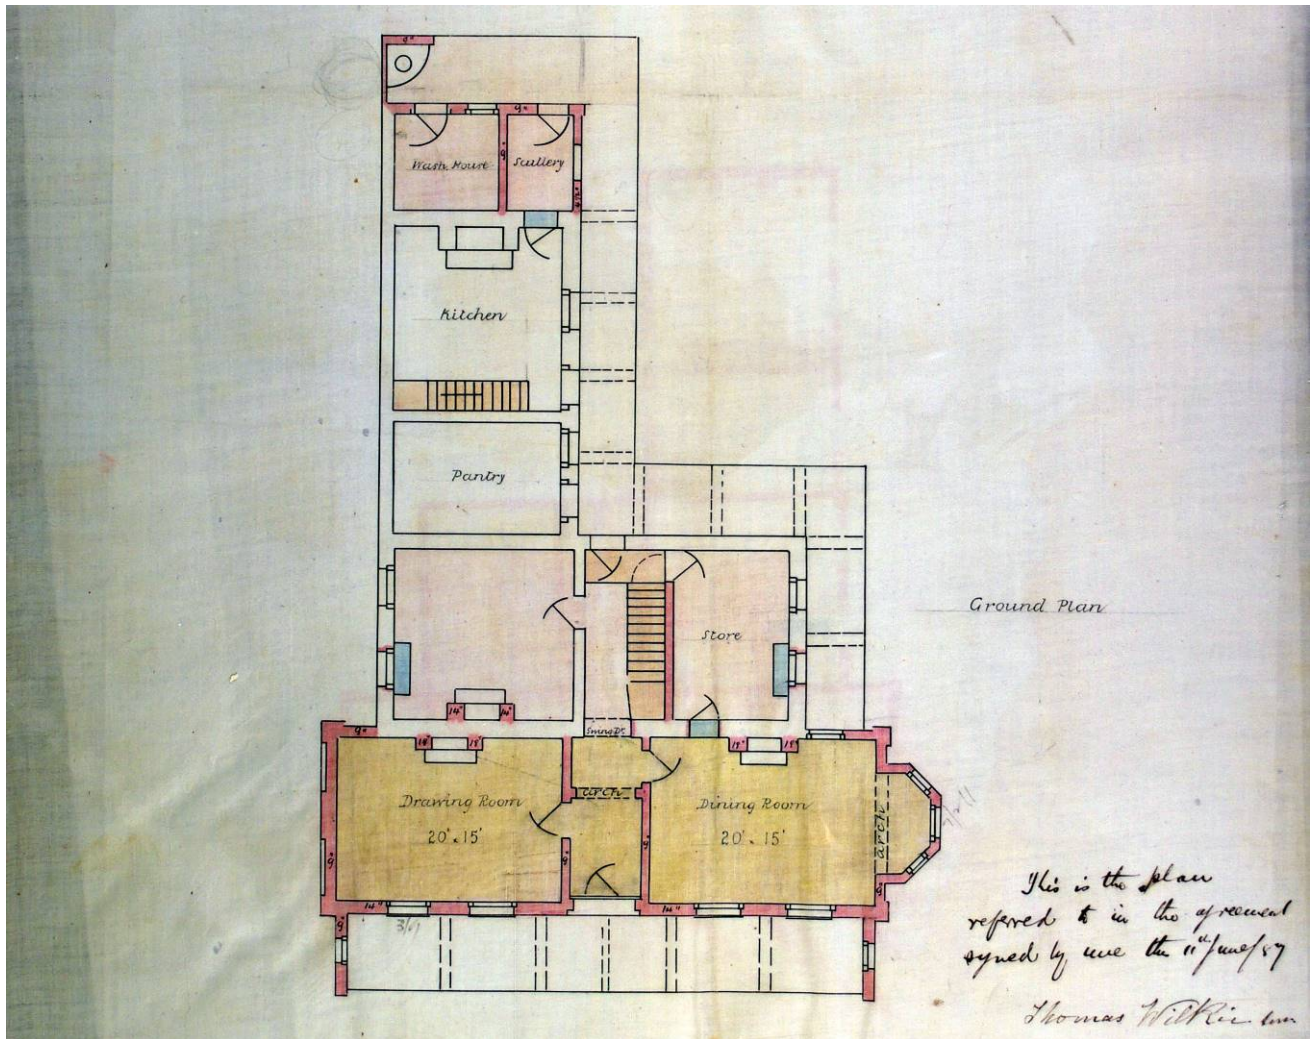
1887 design specification for Teneriffe, showing ground floorplan, note red walls appear to denote brick additions to the existing building (Source: Goulburn Historical Society)
